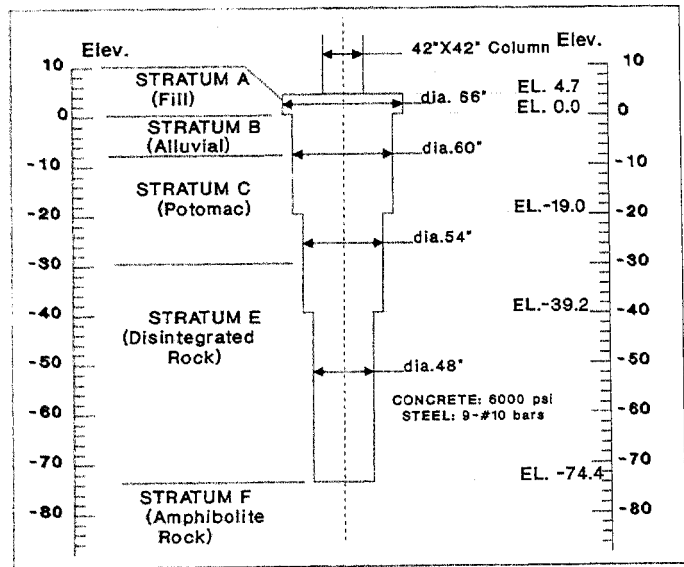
Cross-section of Caisson TA/T7 (As-Built)
